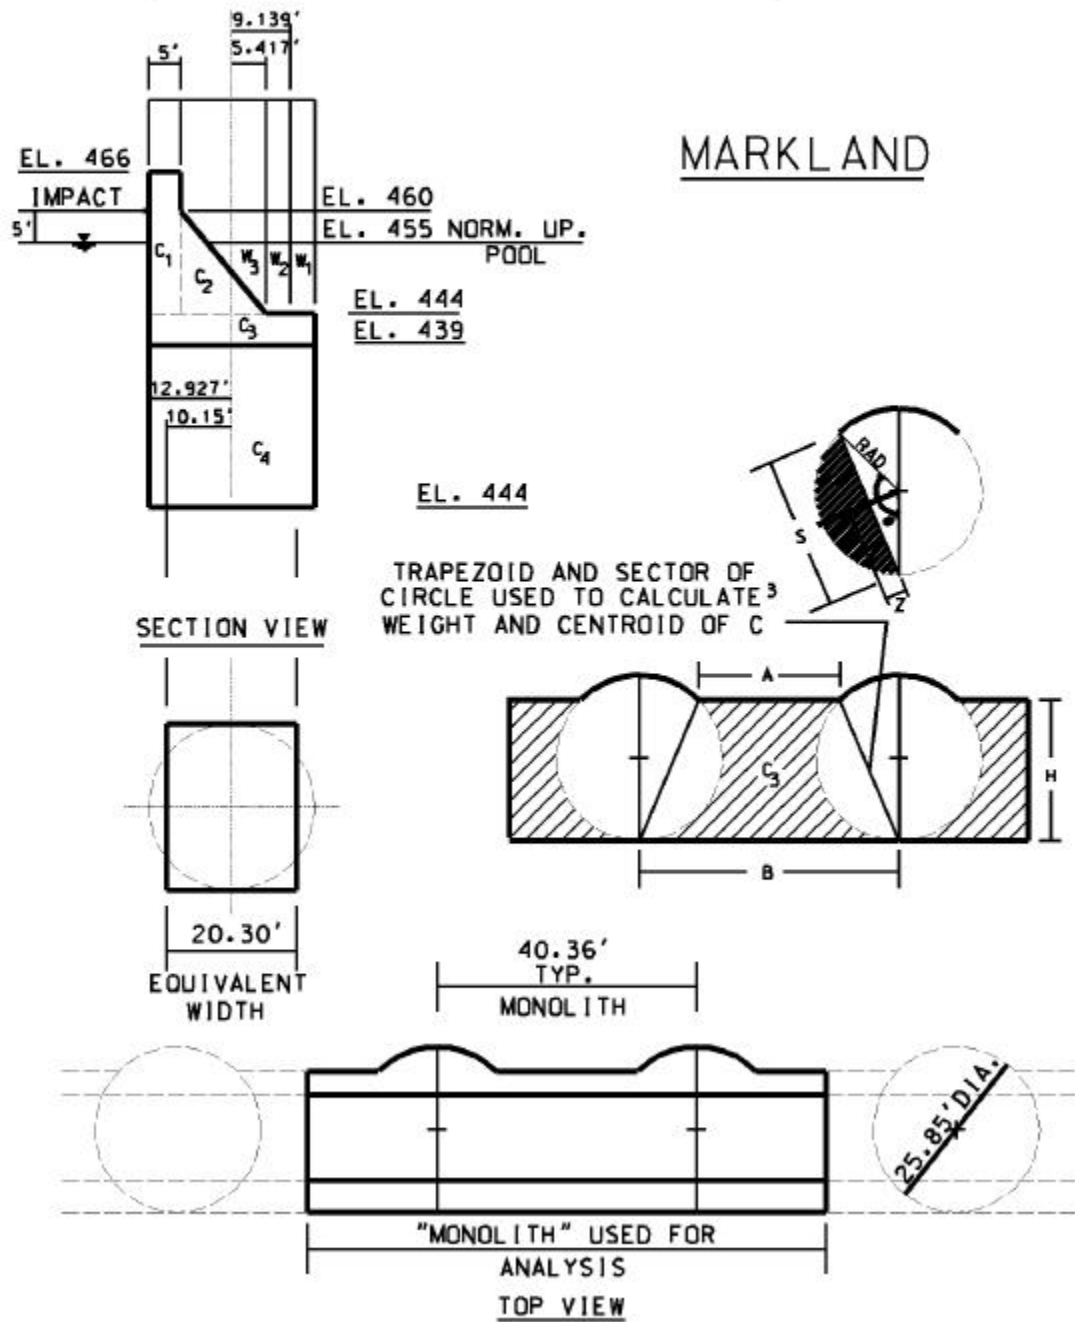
A. Markland Upper Guard Wall Plan and Section
